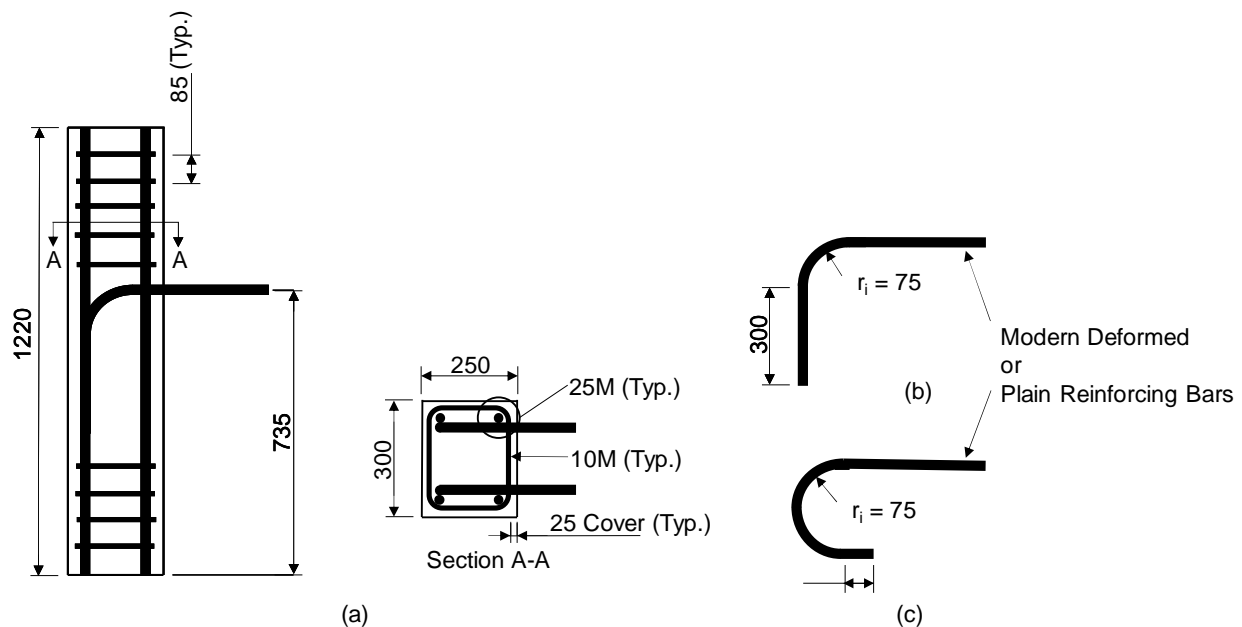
Geometry of the beam-column specimens: (a) elevation and cross-section, (b) details for 90° hooked bars, and (c) details for 180° hooked bars.
